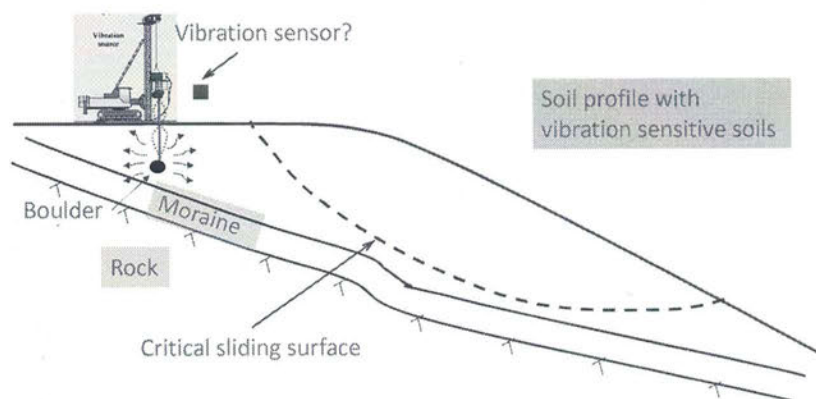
Vibratory sheet pile installation next to slope with vibration sensitive material. When the sheet pile hits strong materials like moraine or a boulder, vibrations in the soil can become large. Driving-stop criteria can help avoiding large vibrations.
